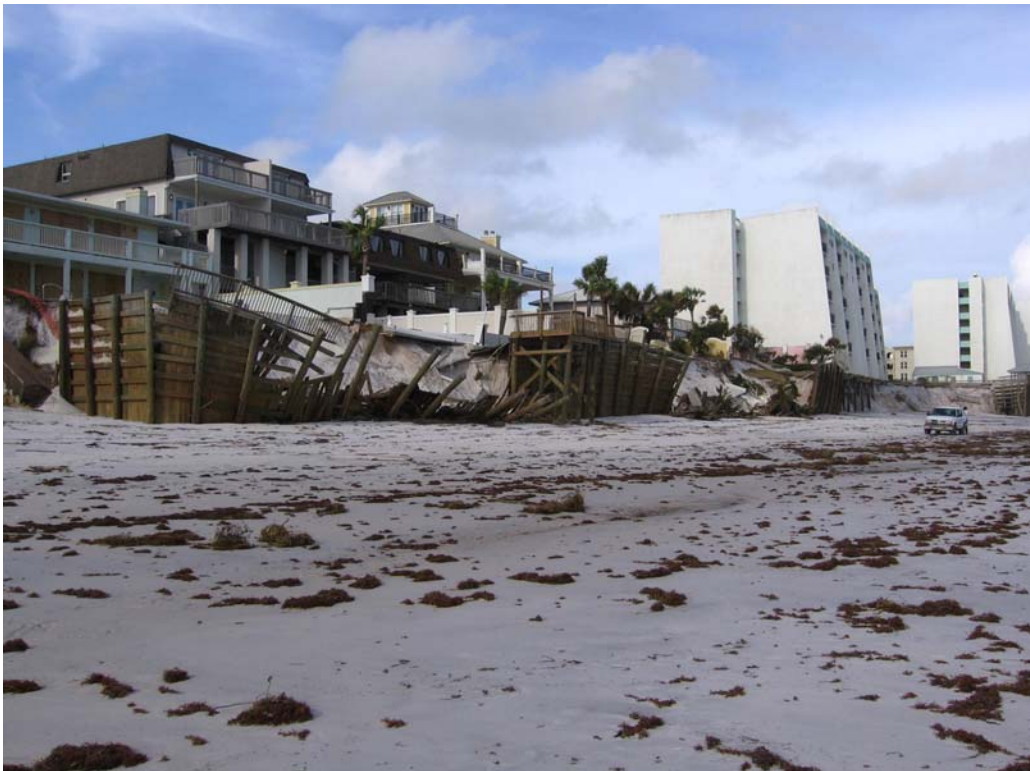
Wood bulkhead destroyed, Miramar Beach (R10).
